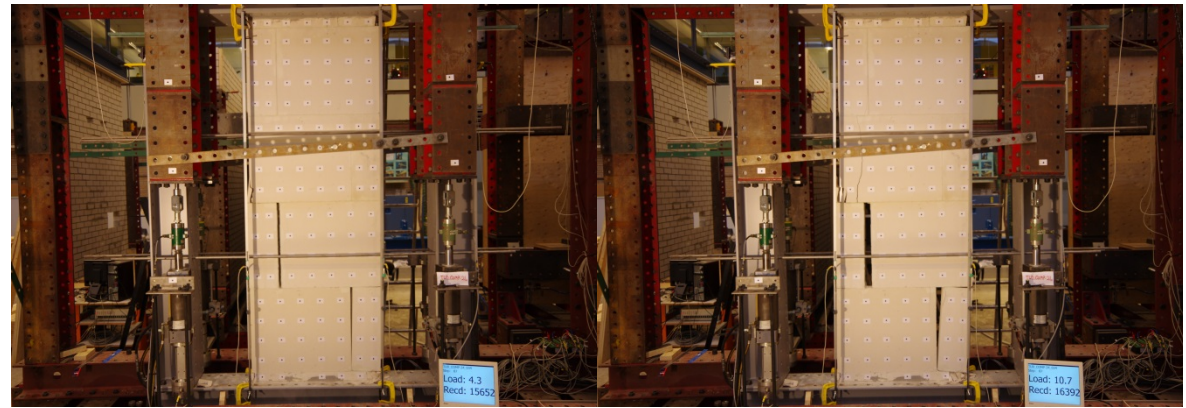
Local deformation for wall TUD_COMP-24: (a) Crack opening and crushing; (b) Sliding.
